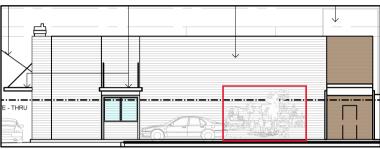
Proposed Signage on North-Western Elevation – Nos. S14 (Outlined Red)
